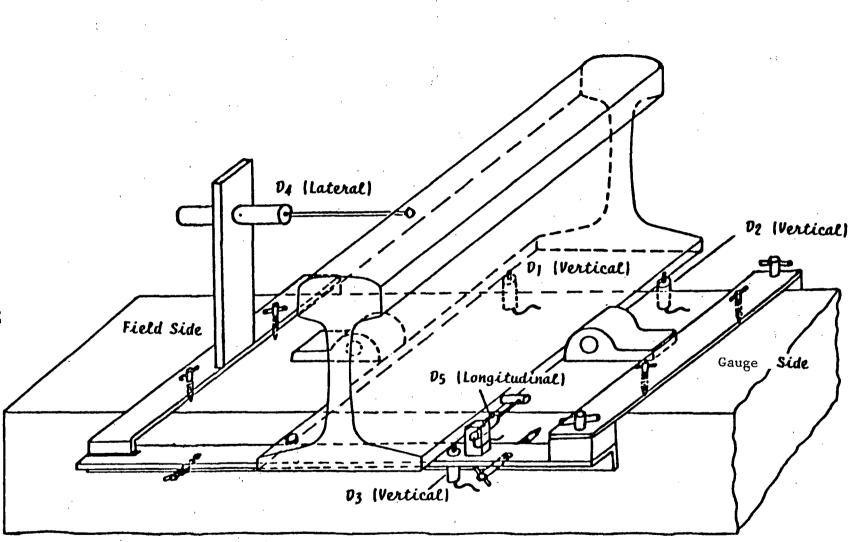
FIXTURE FOR MOUNTING RAIL/TIE DISPLACEMENT TRANSDUCERS
